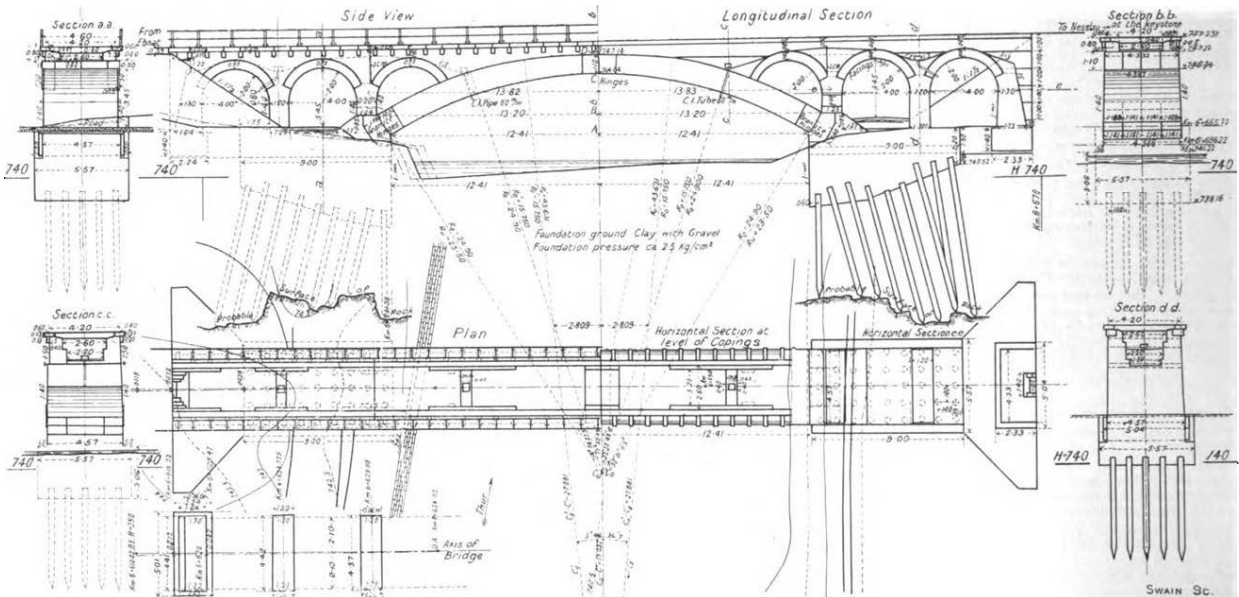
PLAN AND ELEVATION OF THUR BRIDGE, No. II.
